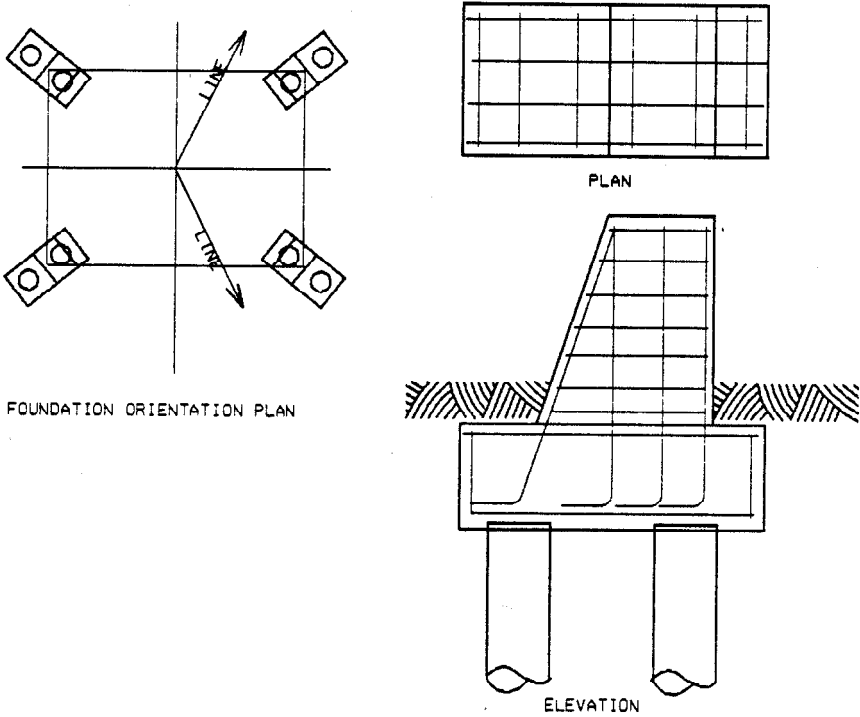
High Reveal Cast-in-Place Concrete Pile Foundation
